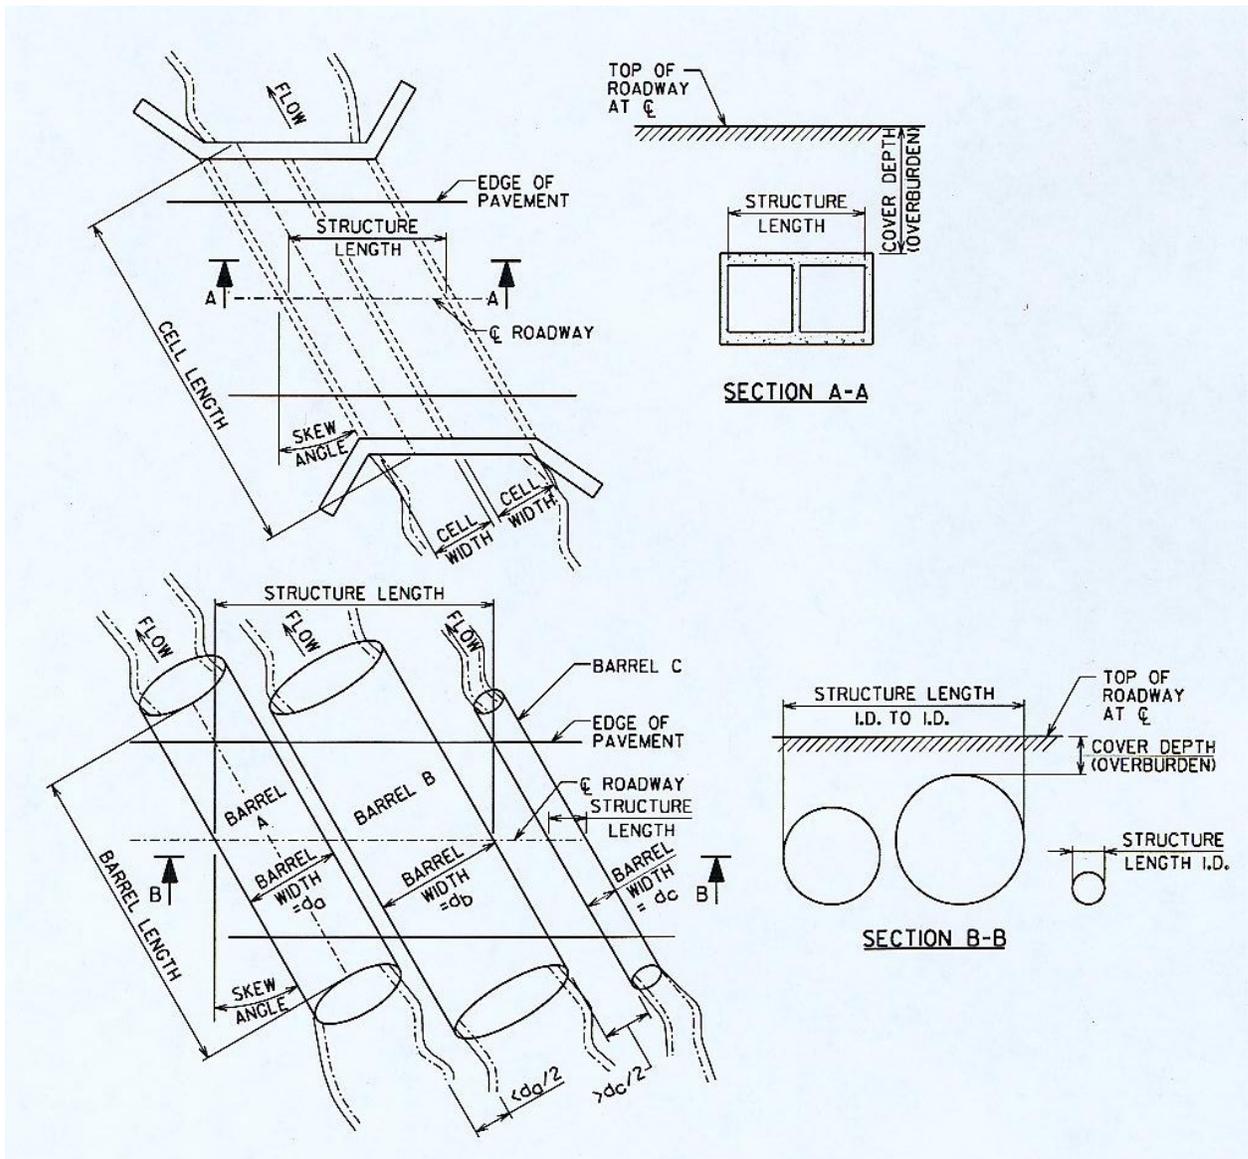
Measurement for Definition of a Culvert Structure.
